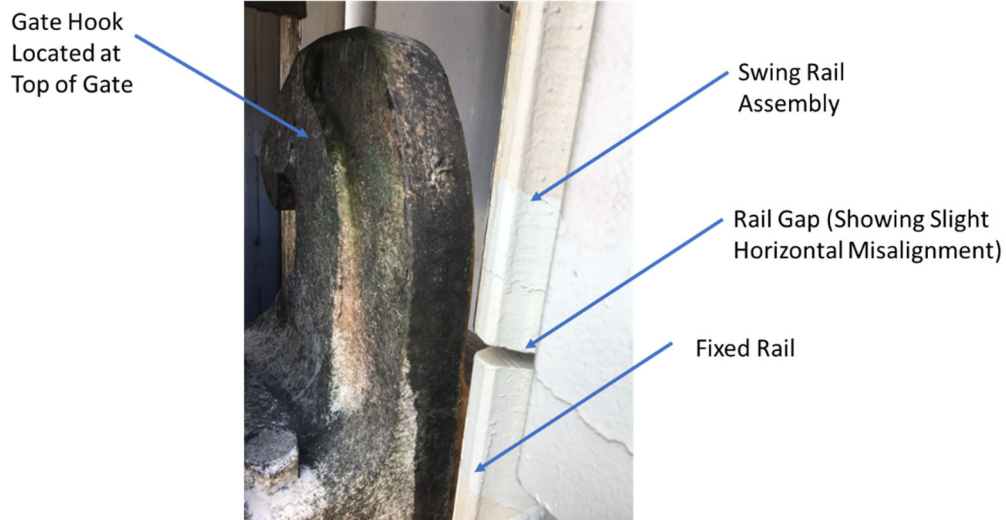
; Rail Gap at North Stanchion of Gate Bay 19
